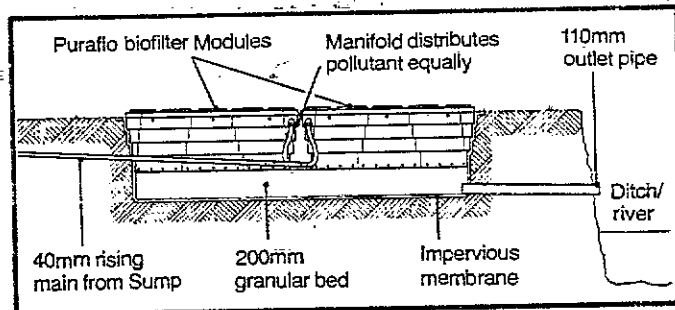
(a) Puraflo system discharging treated effluent into open ditch, stream or river
